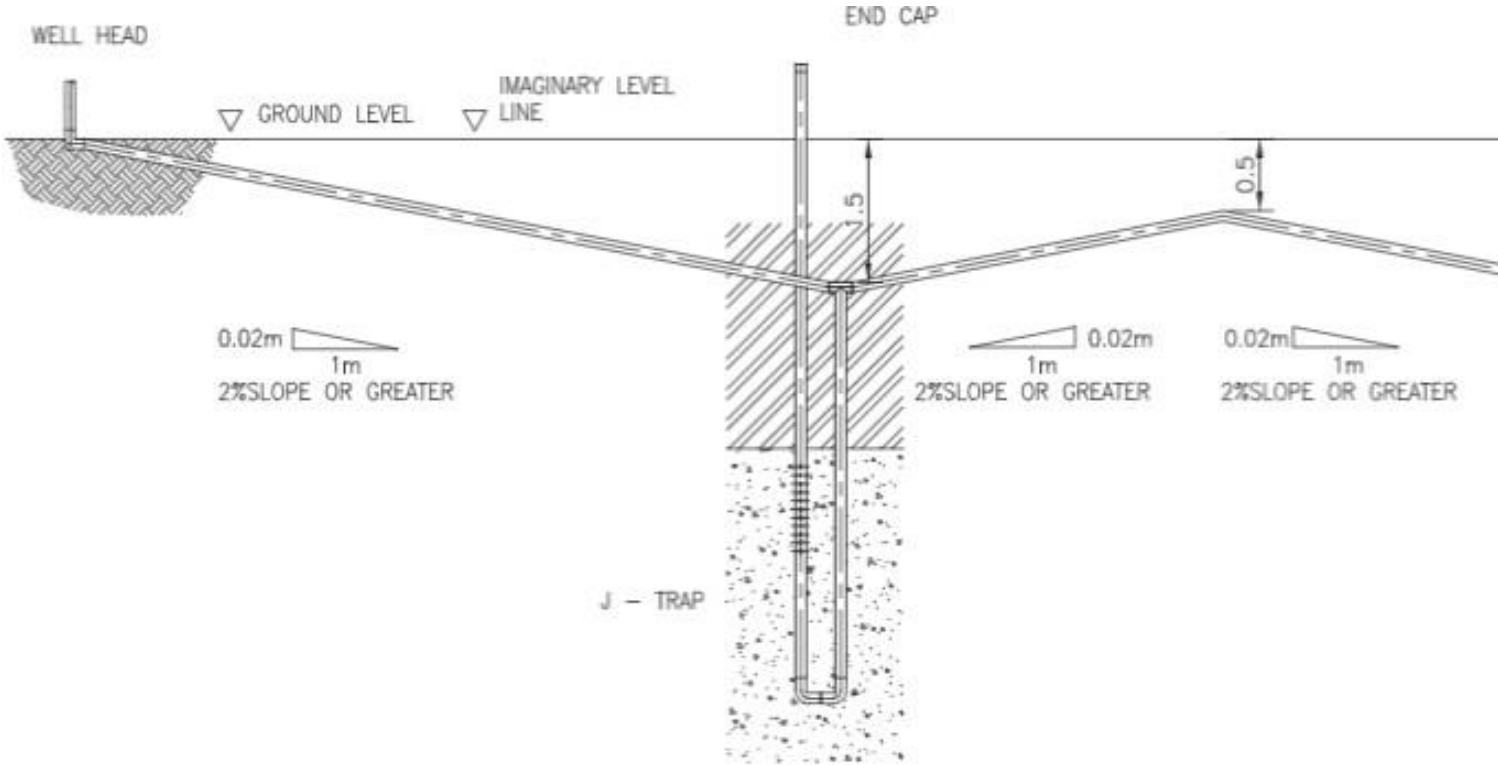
Typical gas well, connecting pipework and J-trap installation (Run Energy, 2021)
